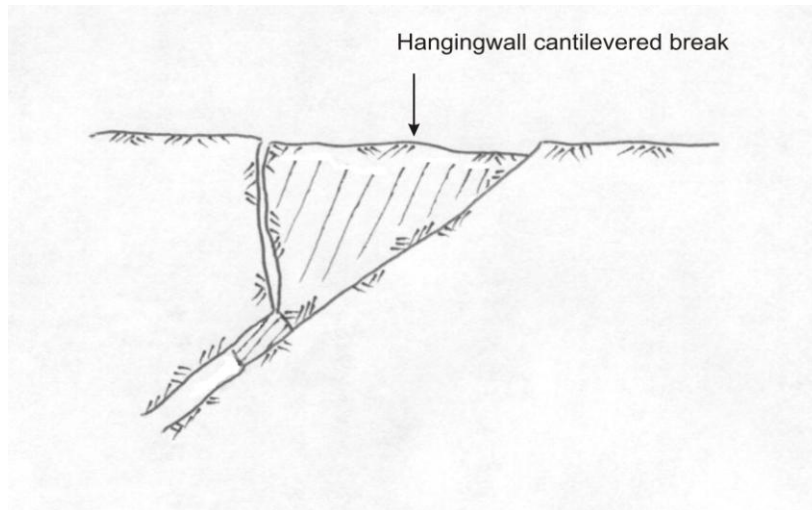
South African gold mine hangingwall break (Stacey, 1981).
